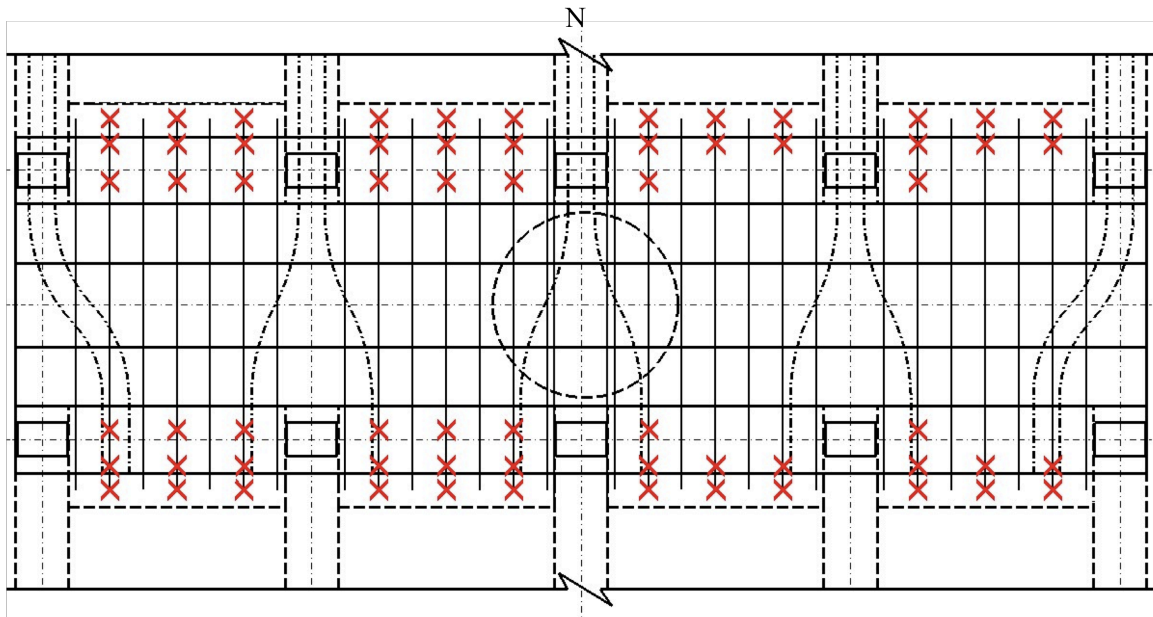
Cap Beam Outer Stirrup Strain Gauge Layout
